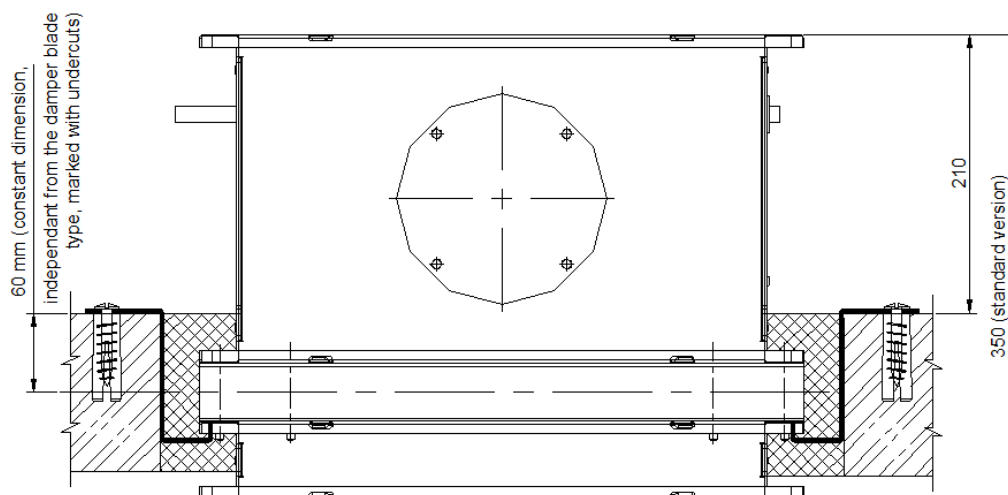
Installation method of fire damper KWP-O-(E)S in rigid compartment – ceiling
